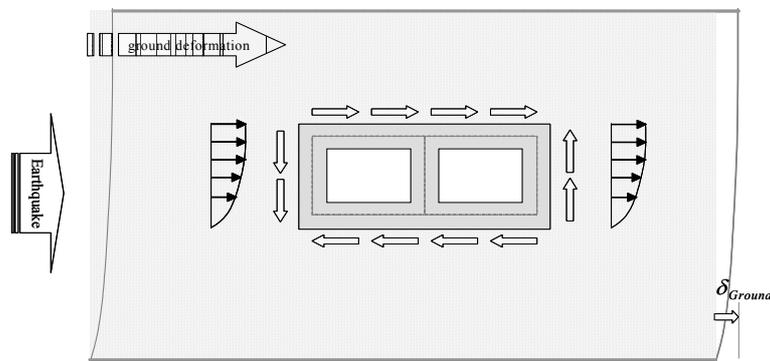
UNDERGROUND STRUCTURES UNDER SEISMIC LOAD
